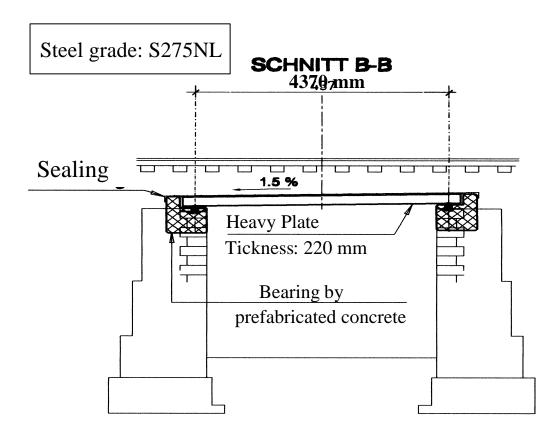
Bridgebuilding with heavy plates, Creux du Maz, CH
